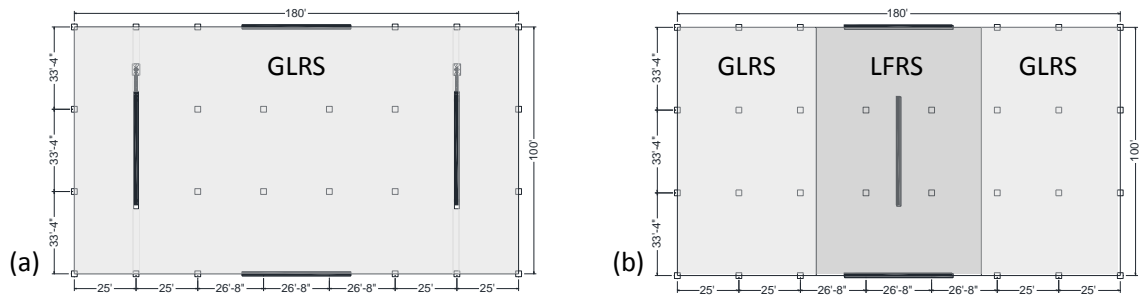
Floor isolation schematic drawing: (a) Full floor; (b) Partial floor.
